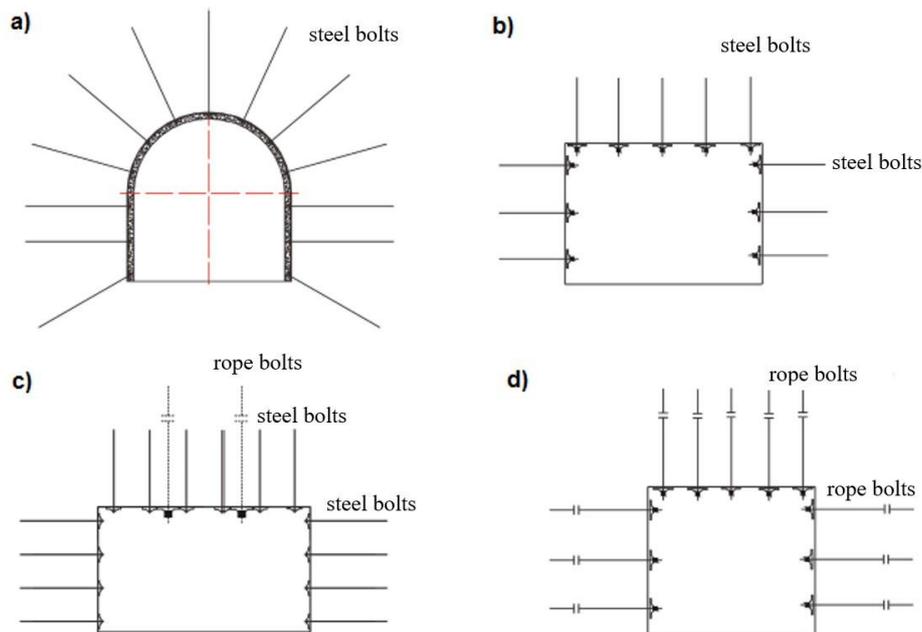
Basic schemes used in Chinese hard coal mines: a) steel bolts and shotcrete, b) steel bolts, c) steel and rope bolts, d) rope bolts [83]
